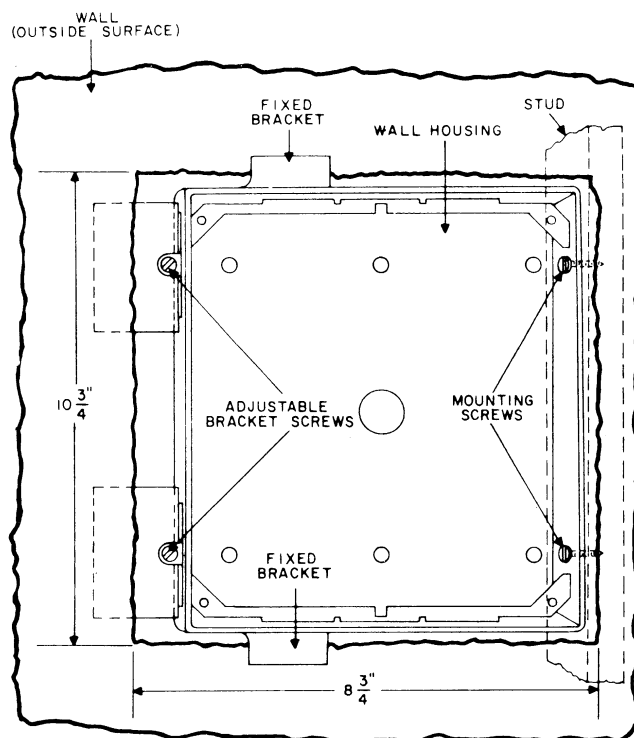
Wall Housing Mounted With 550729 Bracket Set.
